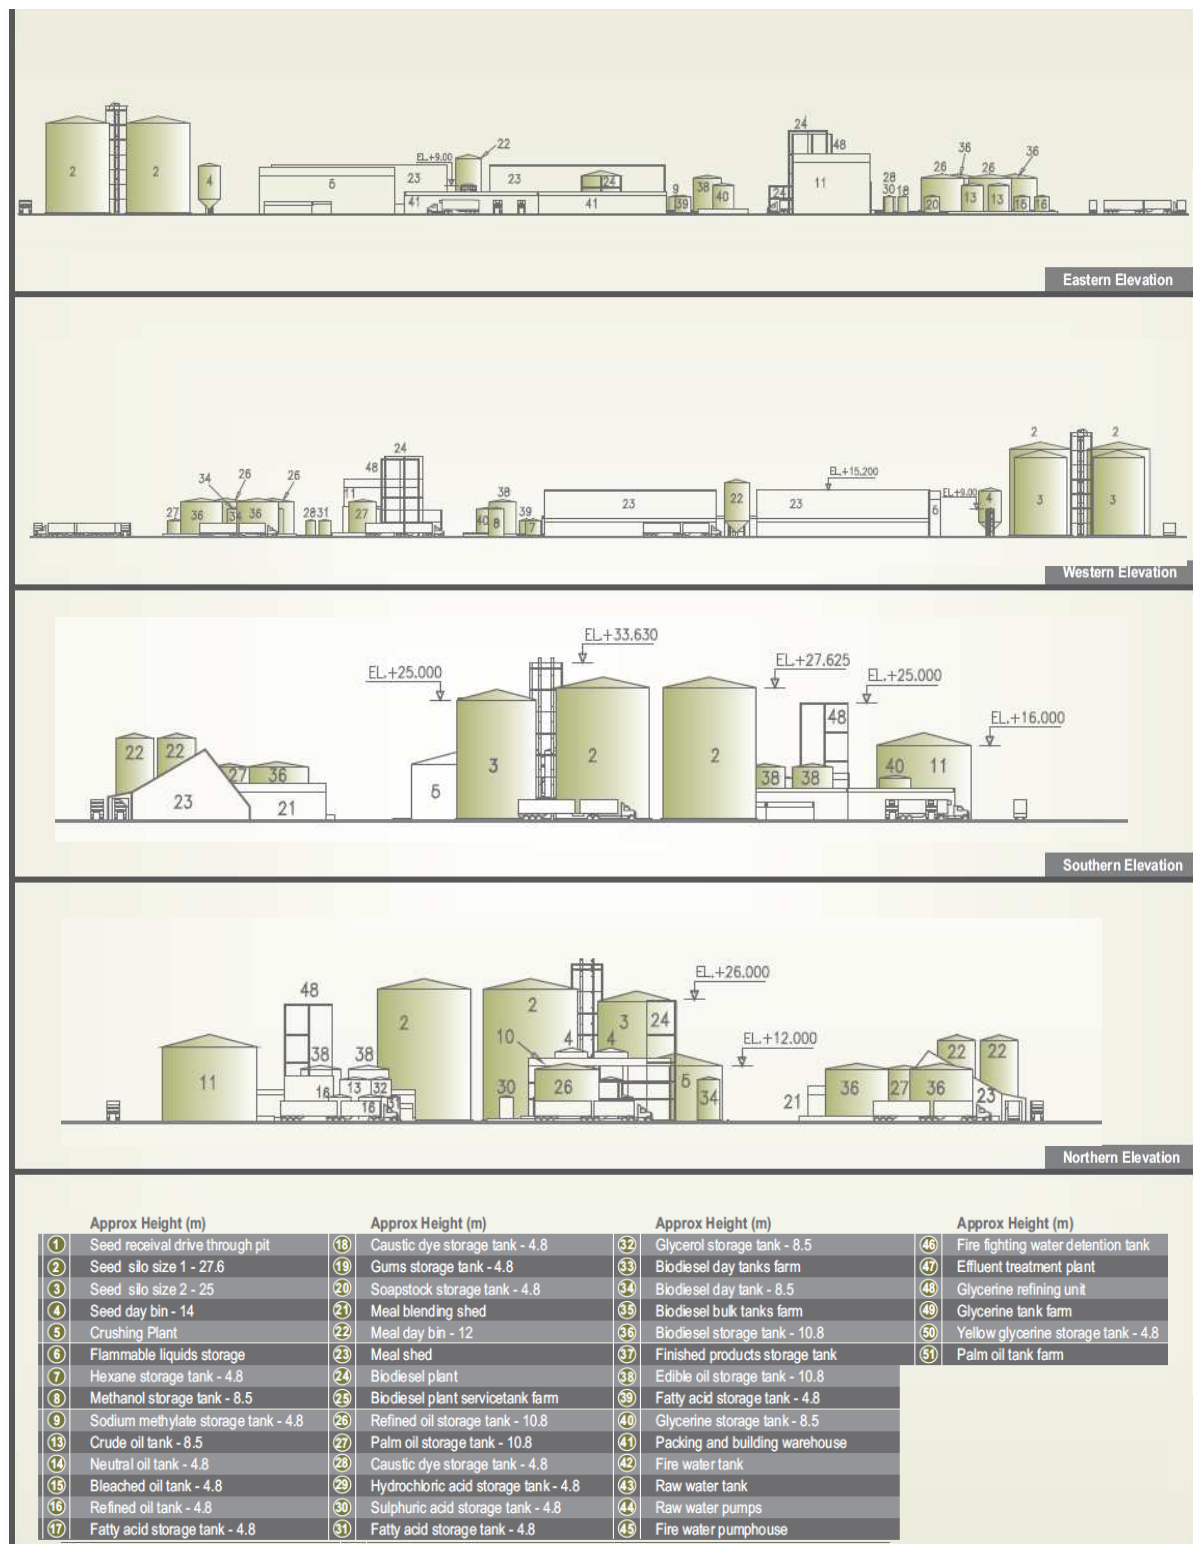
IOPBP Facility built components and elevations as approved (Source: EA 2008, ENSR)
